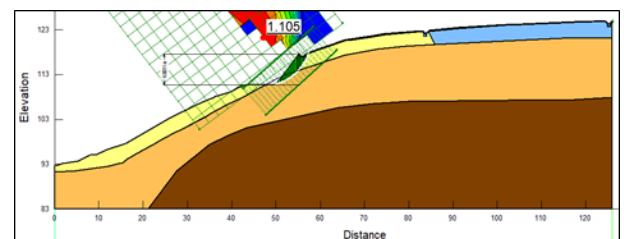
Stability of Initial Excavation [Under rainfall conditions]
